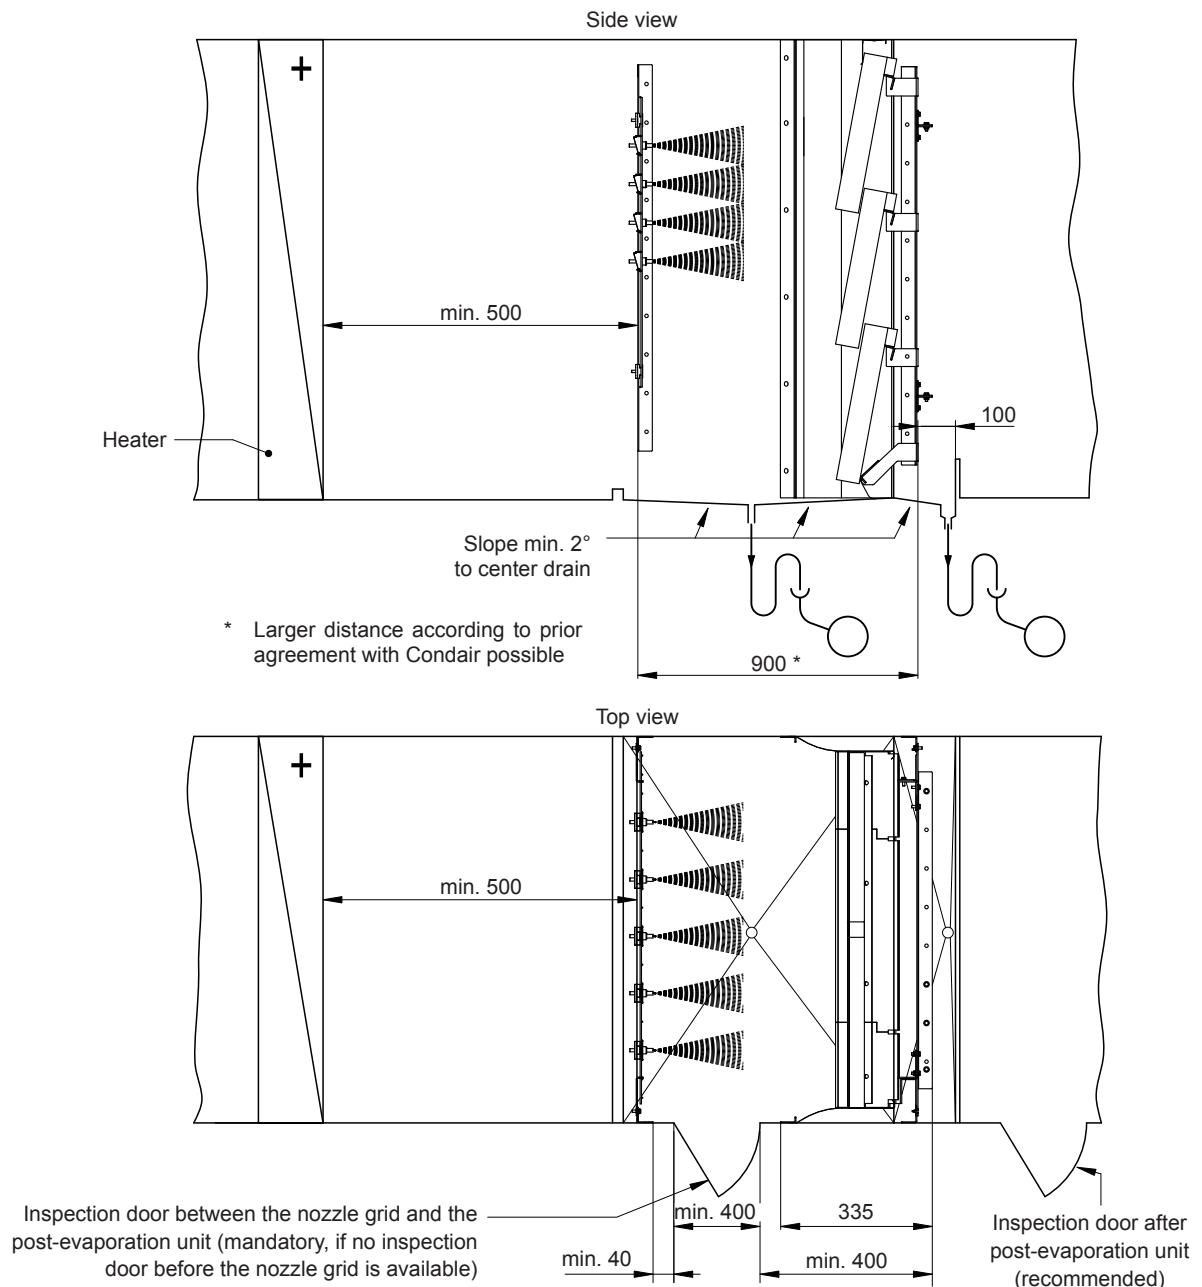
Positioning of the humidification unit with inspection door between nozzle grid and post-evaporation unit and after post-evaporation unit - dimensions in mm
